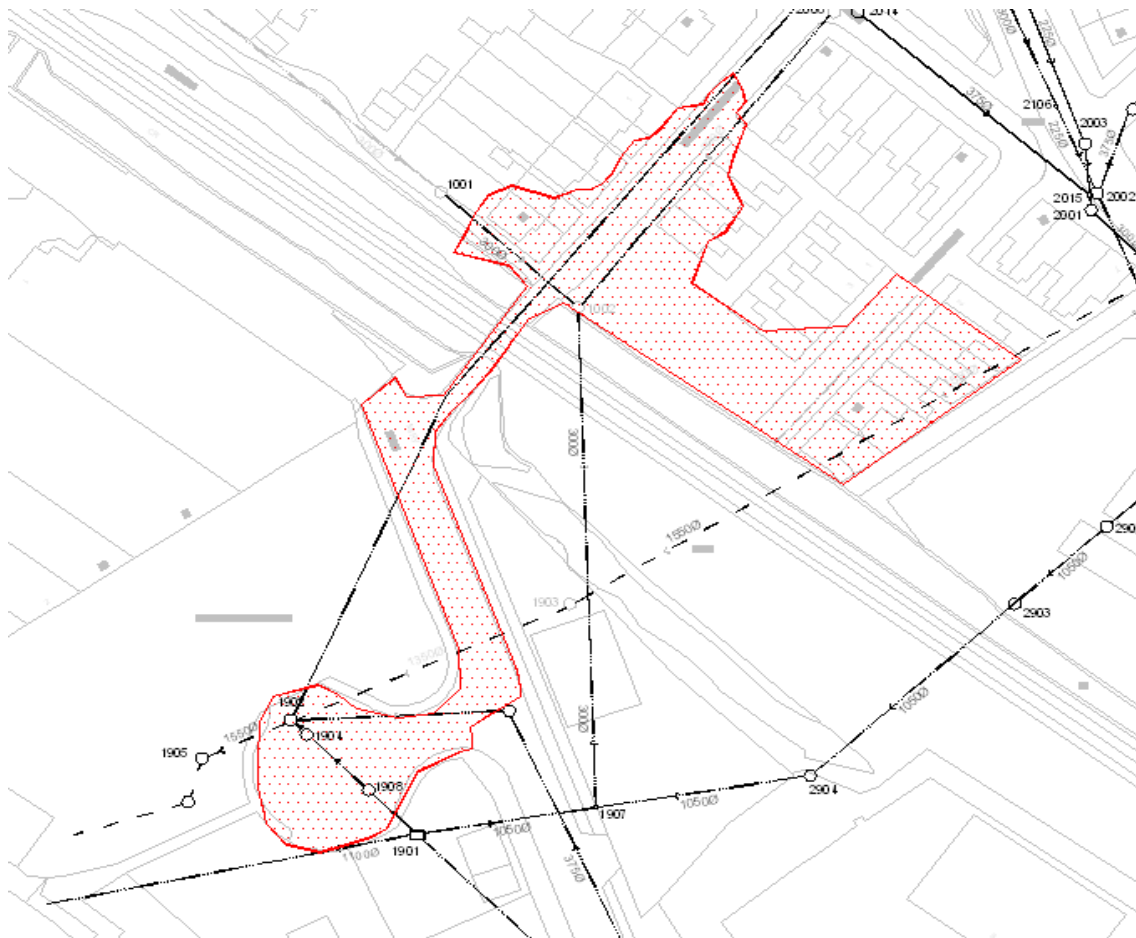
Existing Drainage and Extent of flooding at Beresford Street and Gorman Street
